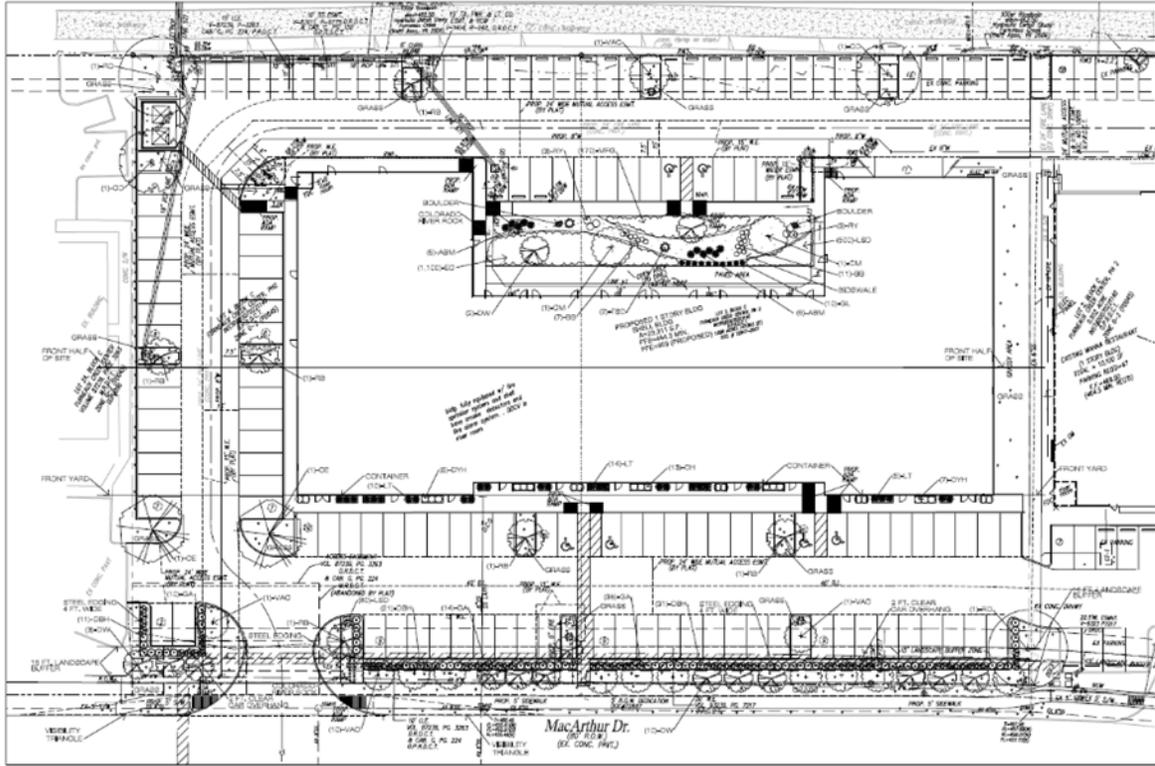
OF 2) Conceptual Landscape Plan
